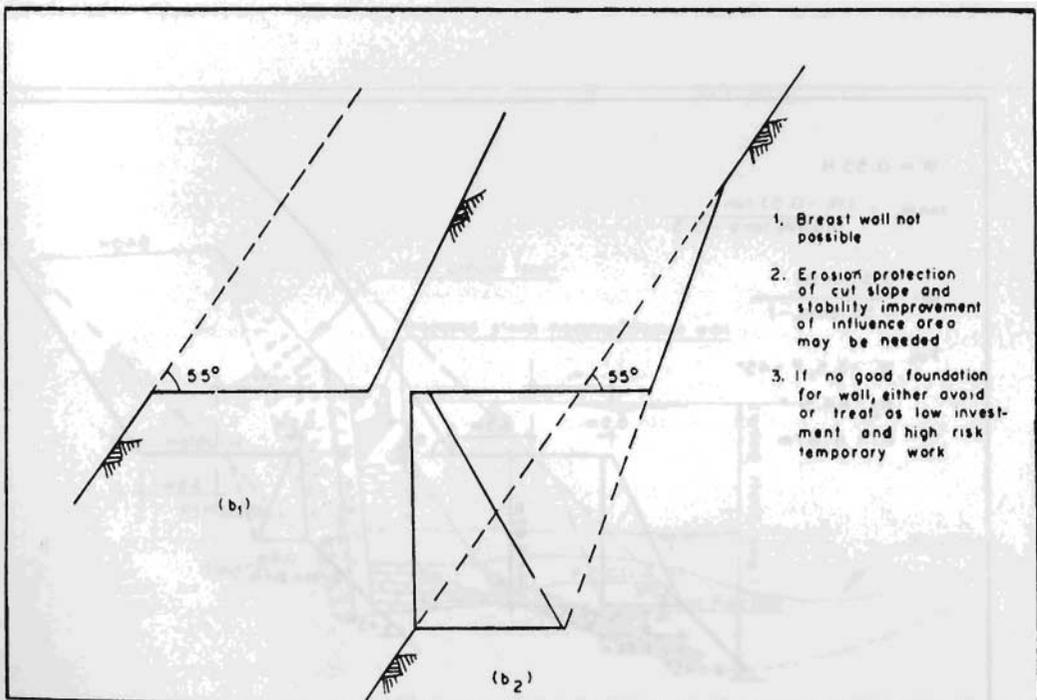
On very steep slopes, breast wall construction is not feasible. By shifting the centre line horizontally and providing a back-battered retaining wall towards the downhill side of the road, the volume of excavation is reduced.
